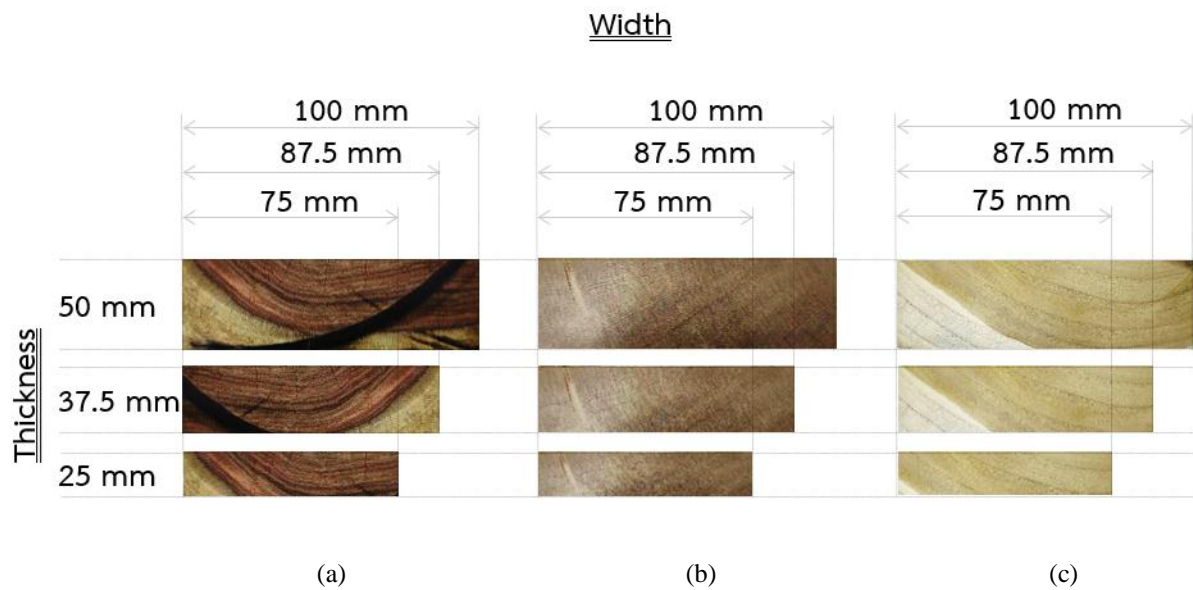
Variation of wood types and cross-section sizes for strengthening built-up member: (a) Burma Padauk wood, (b) Tabek wood and (c) Teak wood.
